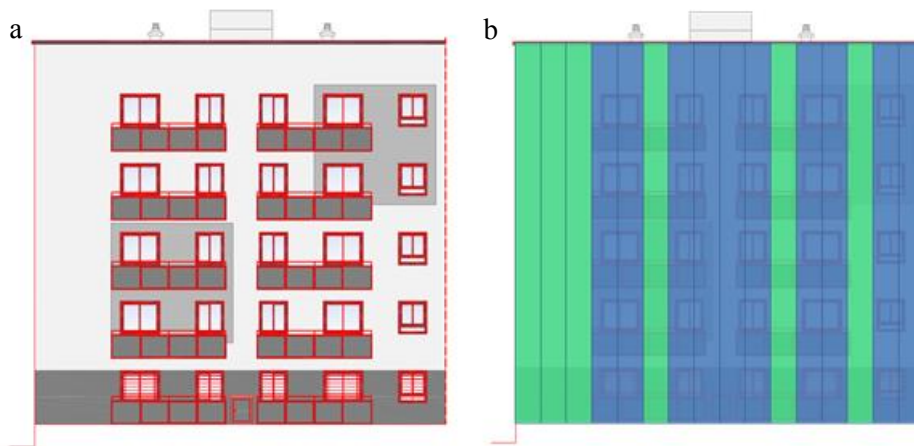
(a) Target block building located in Madrid; (b) Disposition of panels in the façade.
